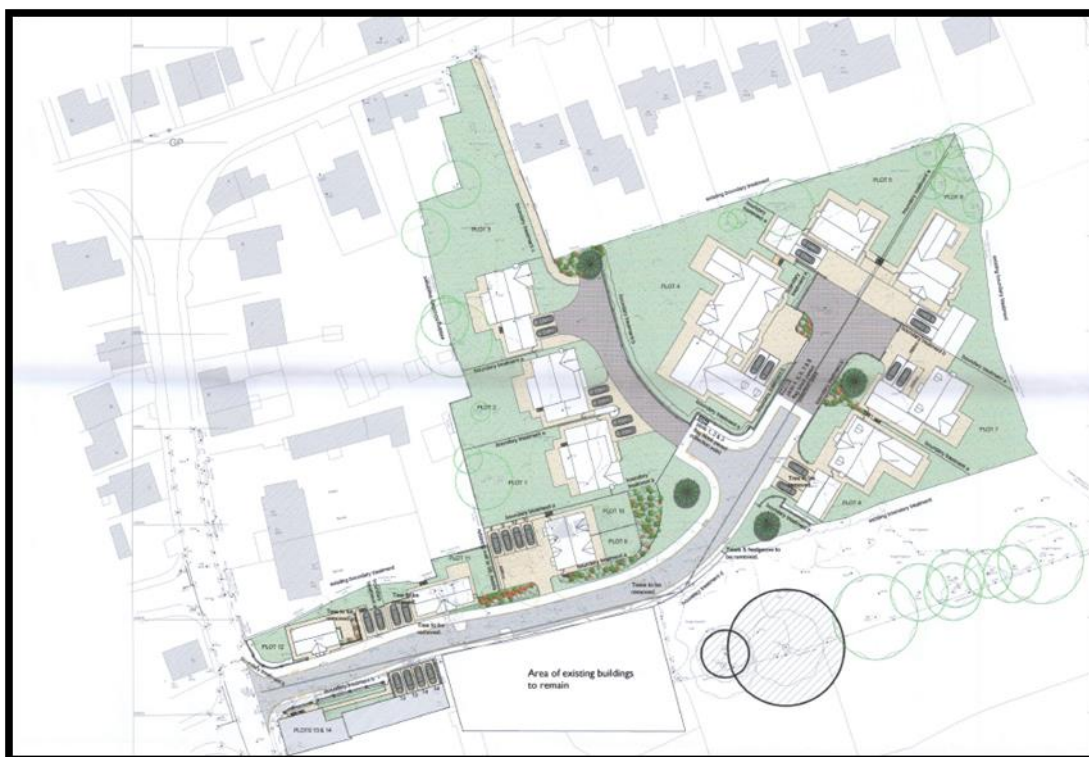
Approved site layout with link connecting the site to Birkinstyle Lane
